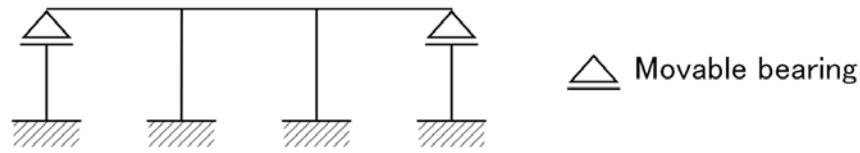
A rahmen bridge rigidly supported by at least two piers
